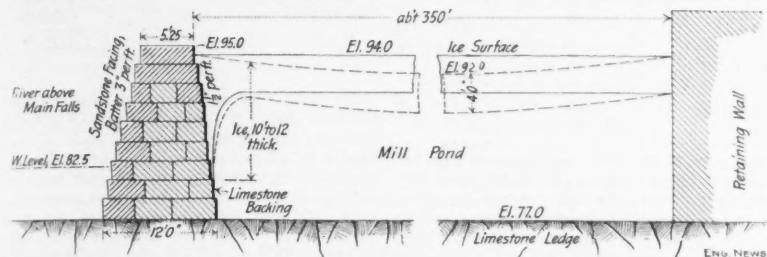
CROSS-SECTION OF DAM AND MILL POND OF THE MINNEAPOLIS MILL CO.
